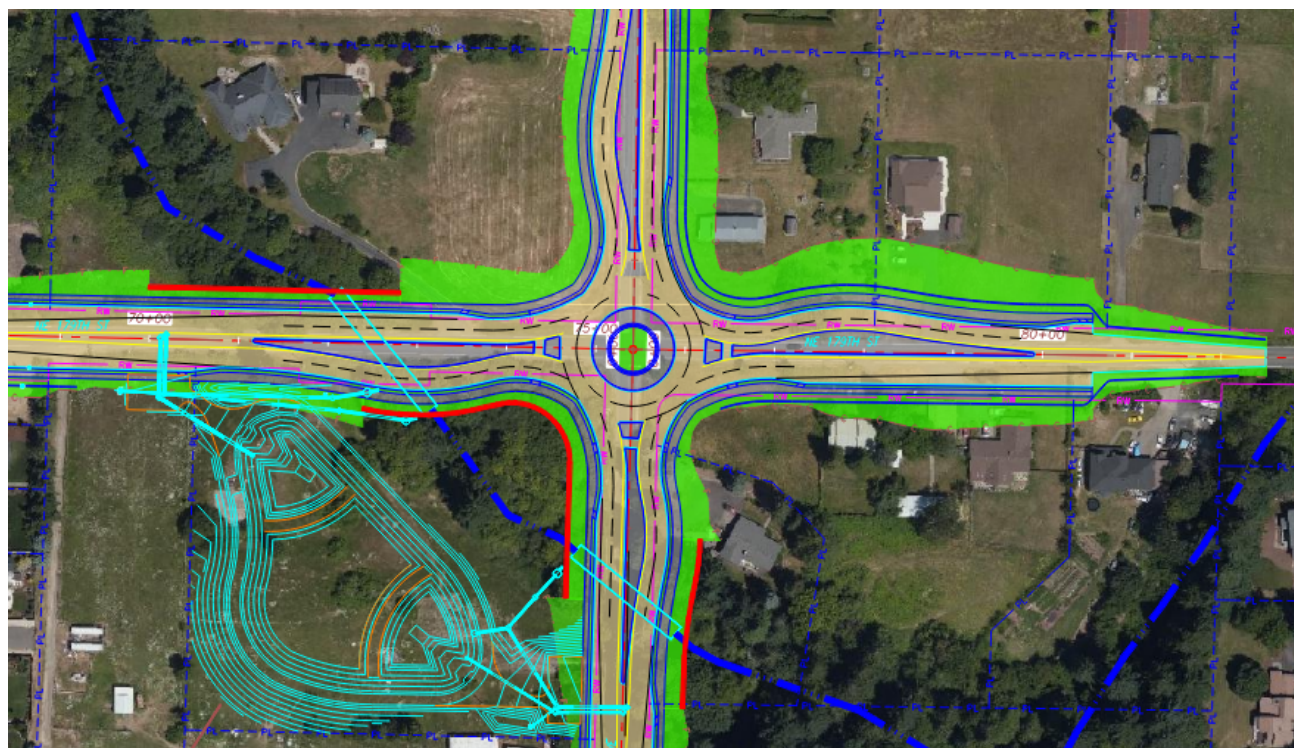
Conceptual Layout of Multilane Roundabout Alternative
